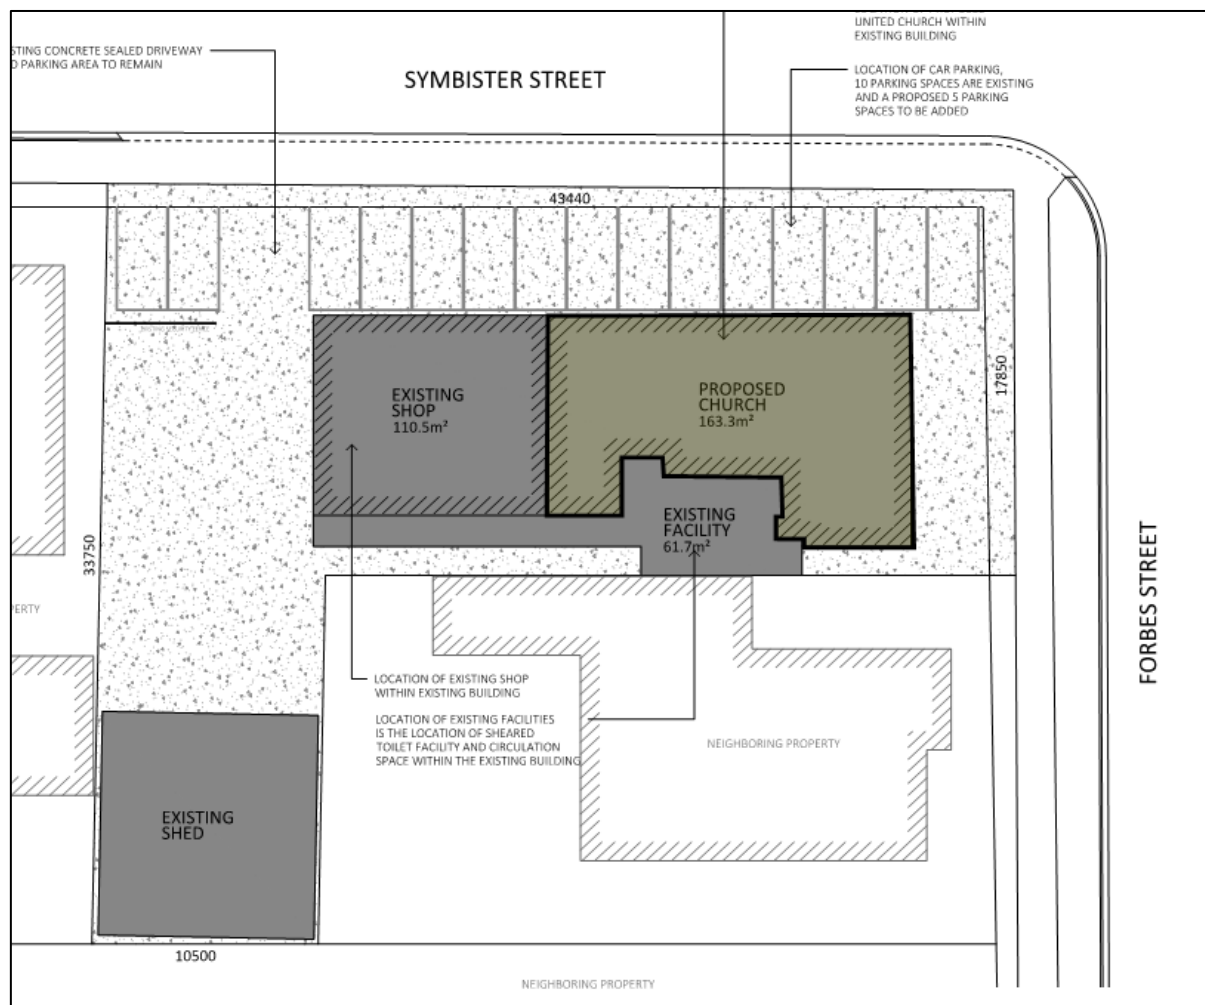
Site Plan with church location highlighted (Lachlan Walsh Design, 2018)
